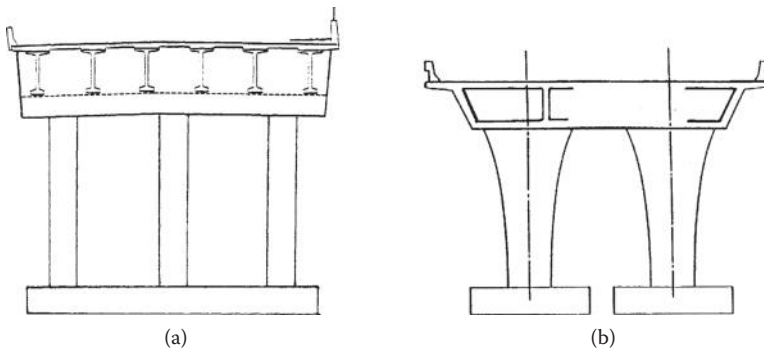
Typical pier types for concrete bridges: (a) Bent for precast girders (b) Bent for cast-in place girders.
